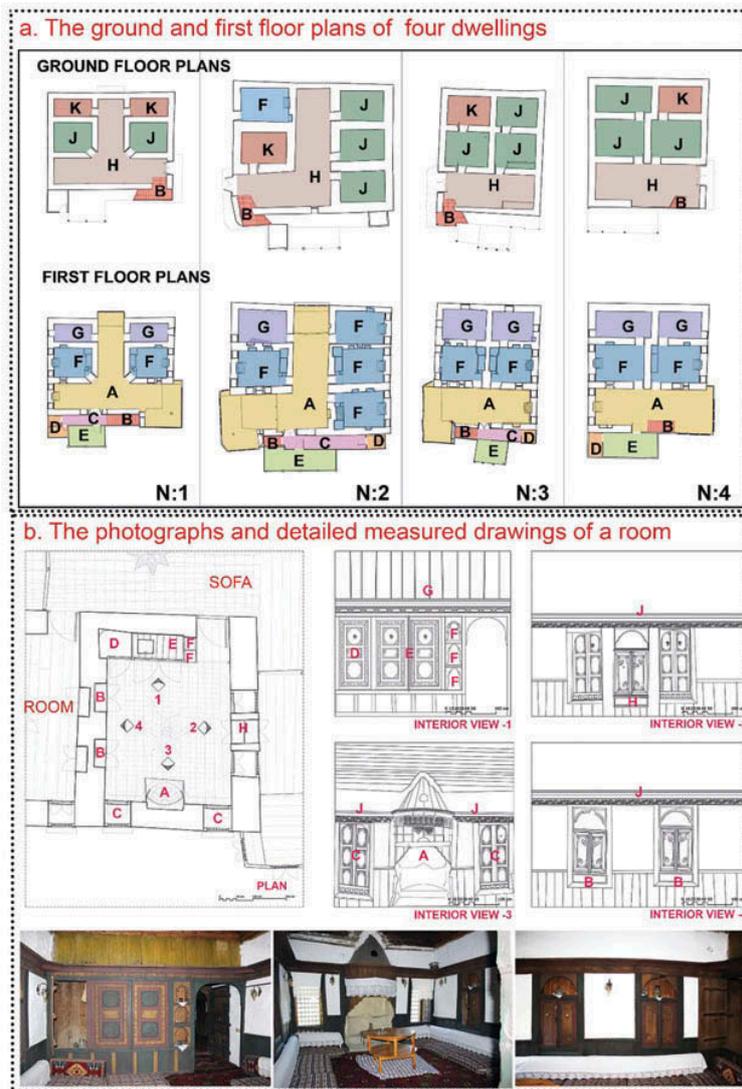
(a) The ground and first floor plans of four dwellings: (N:1) Ömer Duruk 1, (N:2) Ömer Duruk 2, (N:3) Mehmet Duruk and (N:4) Havva Petek. (b) The photographs and detailed measured drawings of a room in the Ömer Duruk dwelling: (A) the fireplace (“başmak”), (B) cupboards, (C) window, (D) ablution niche (“gusülhane”), (E) closet (“yükçük”), (F) the niches (“lambalık”), (G) “musandıra”, (H) inner window, (J) shelf (“terek”).
